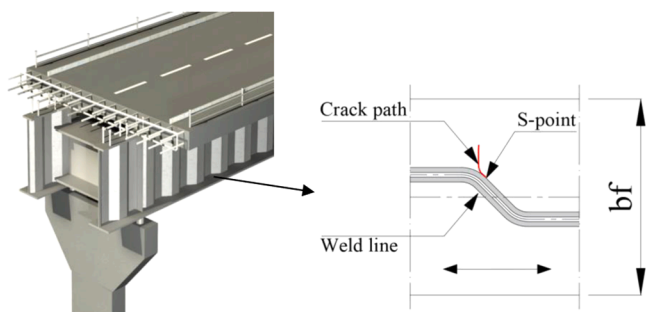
Typical location of fatigue crack in corrugated web girders.
